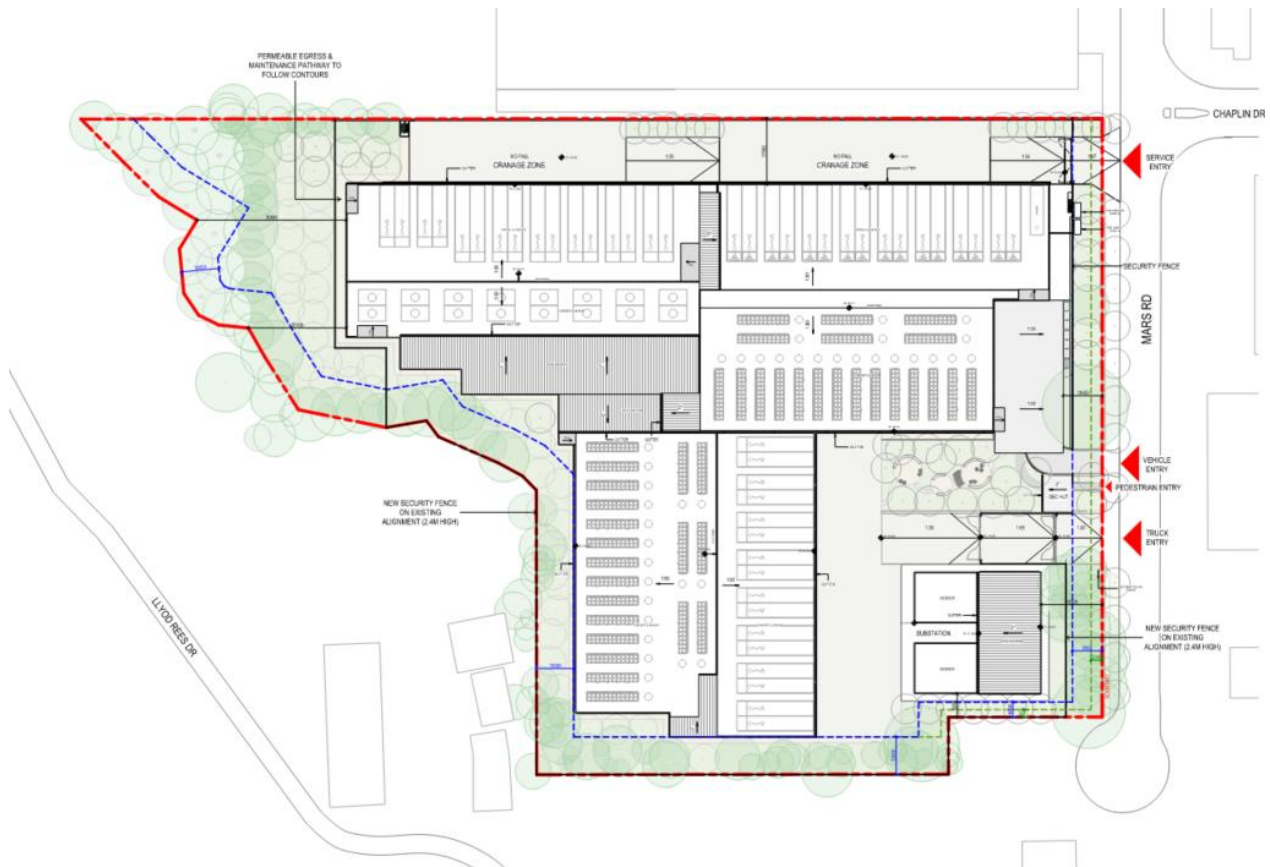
Proposed Site Plan (HDR Inc, December 2025)
